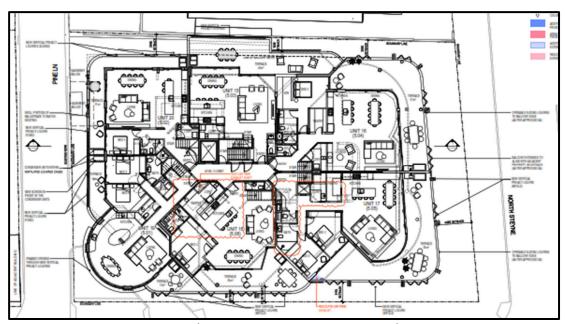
s4.55 Level 3 Floor Plan; (amendment in orange clouds + text); Squillace, September 2022
